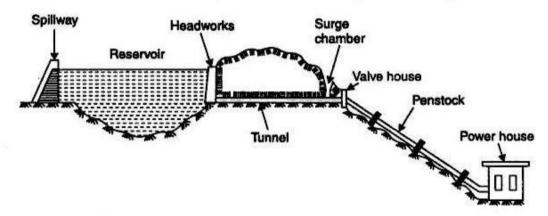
High head power plant layout. The main dam, spillway, and powerhouse stand at widely separated locations. Water flows from the reservoir through a tunnel and penstocks to the turbines.
